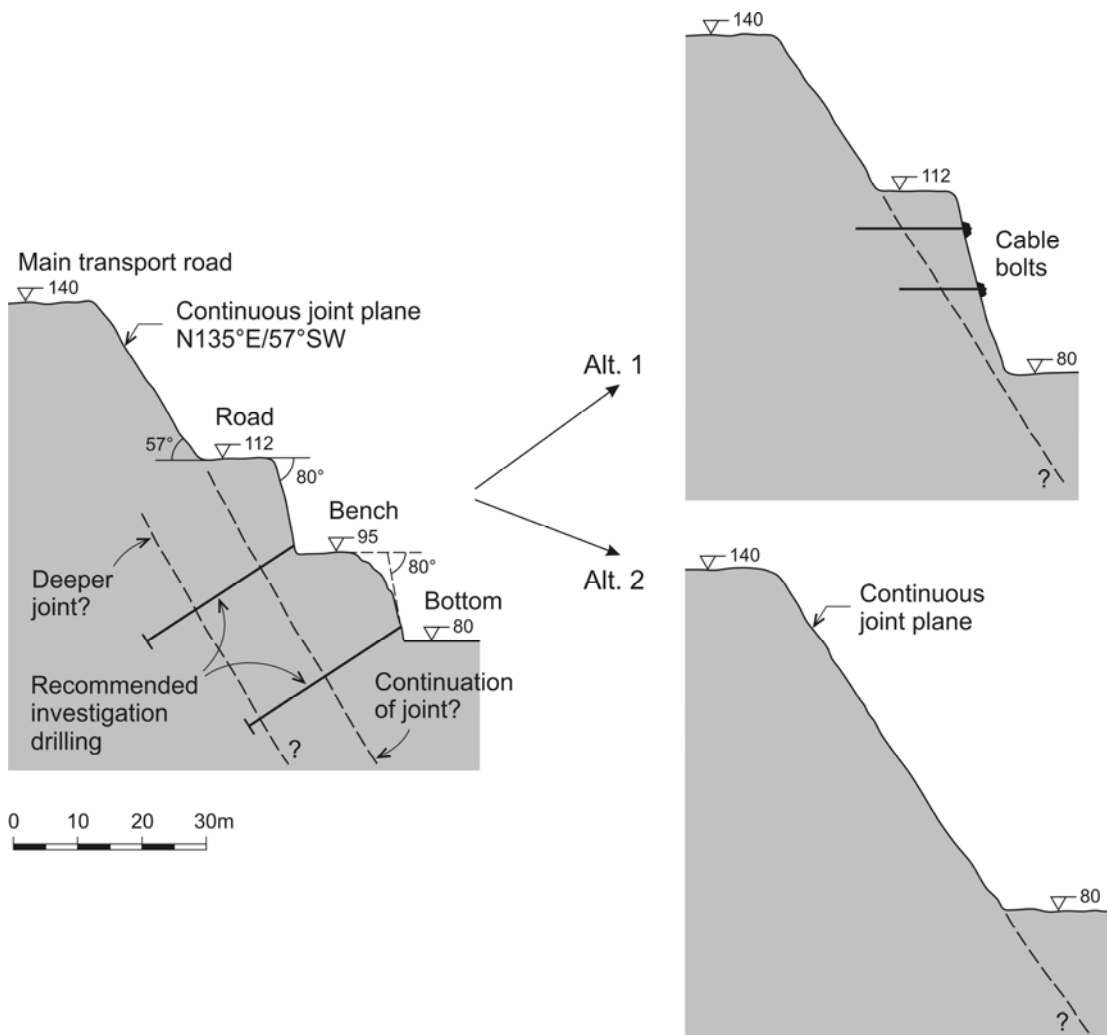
Cross section of the temporary pit wall below the main transport road shown in Figure 7, and the two alternatives for final wall design between level 140 and 80 (right).
